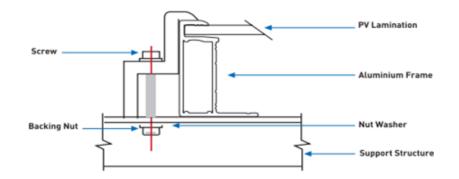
PV MODULES INSTALLES USING FRINGE CLAMPING METHOD
